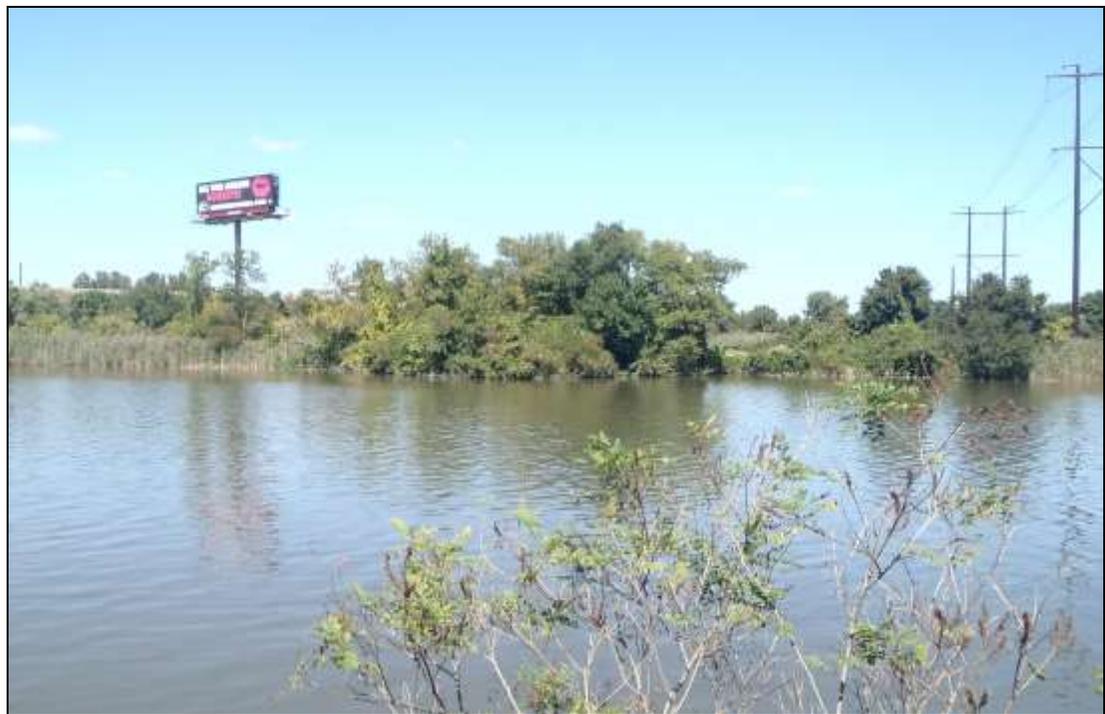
View of Abandoned Railroad Bridge Abutment on North Side of Christina River, Looking North from South Abutment.
